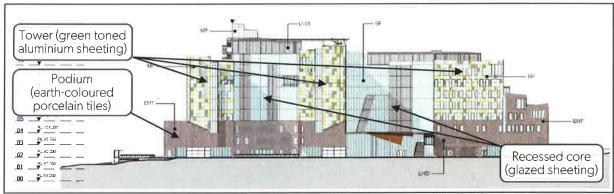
| Southern (revised) elevation (Source: Applicant's RtS 2018)
